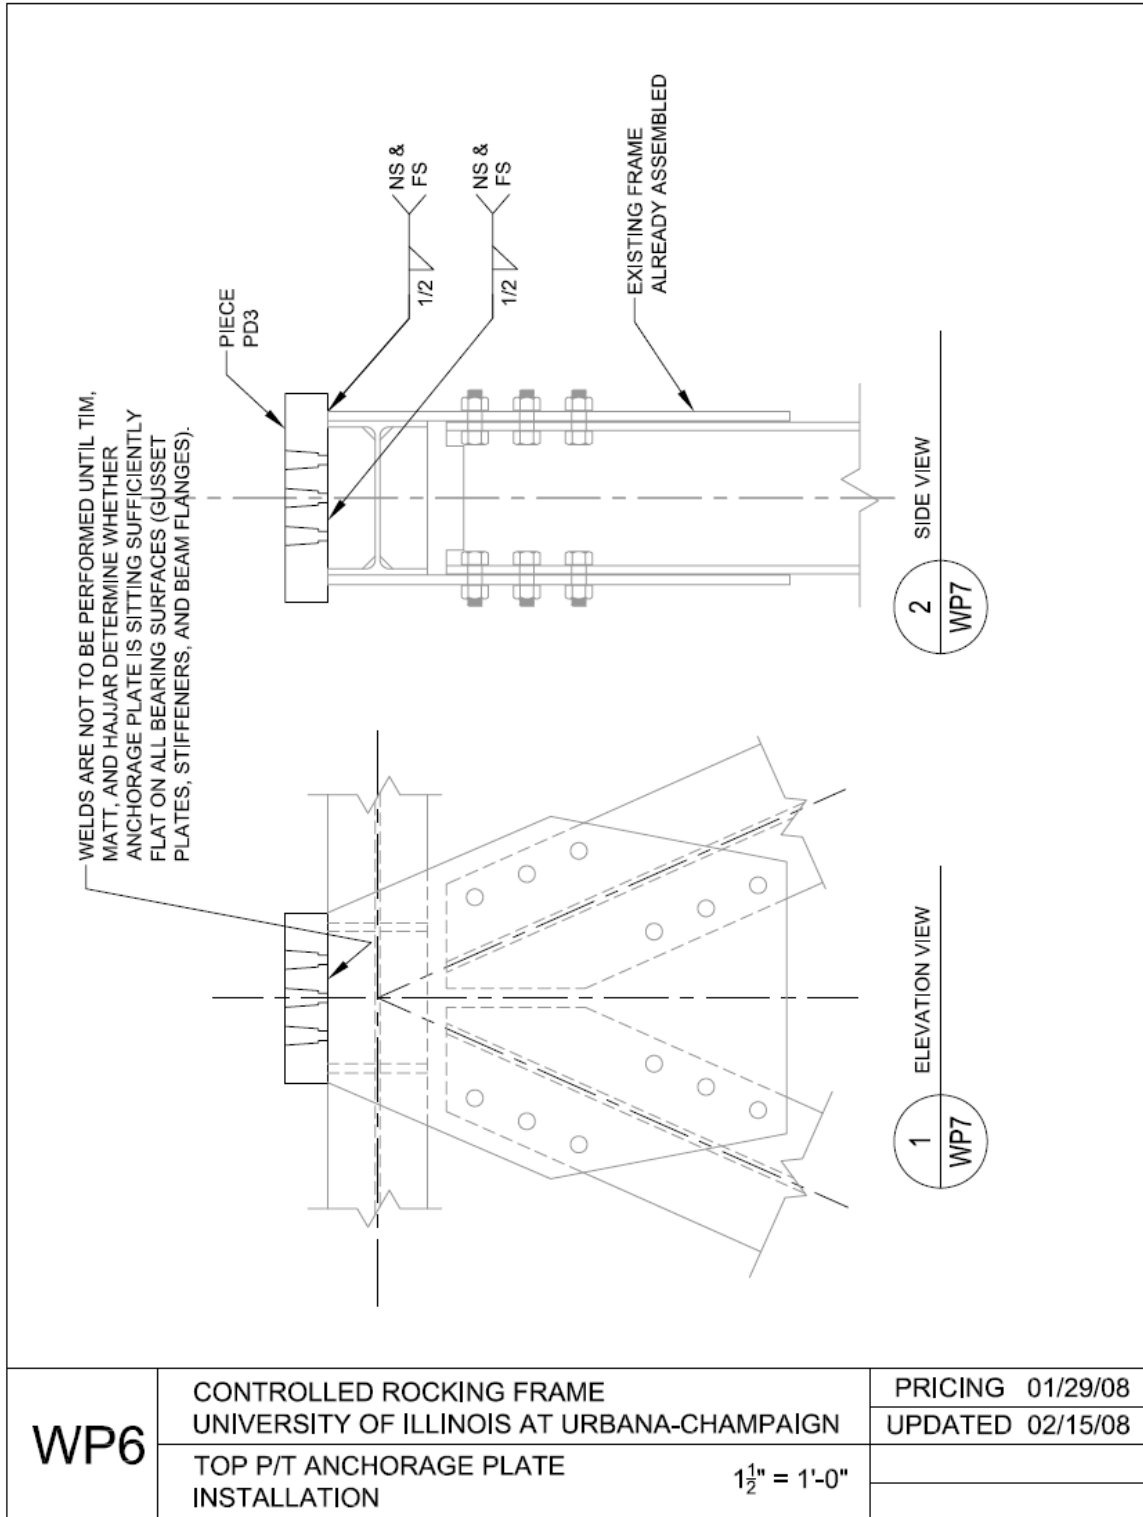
Work Plan Drawing – Top Post-Tensioning Anchorage Plate Installation
